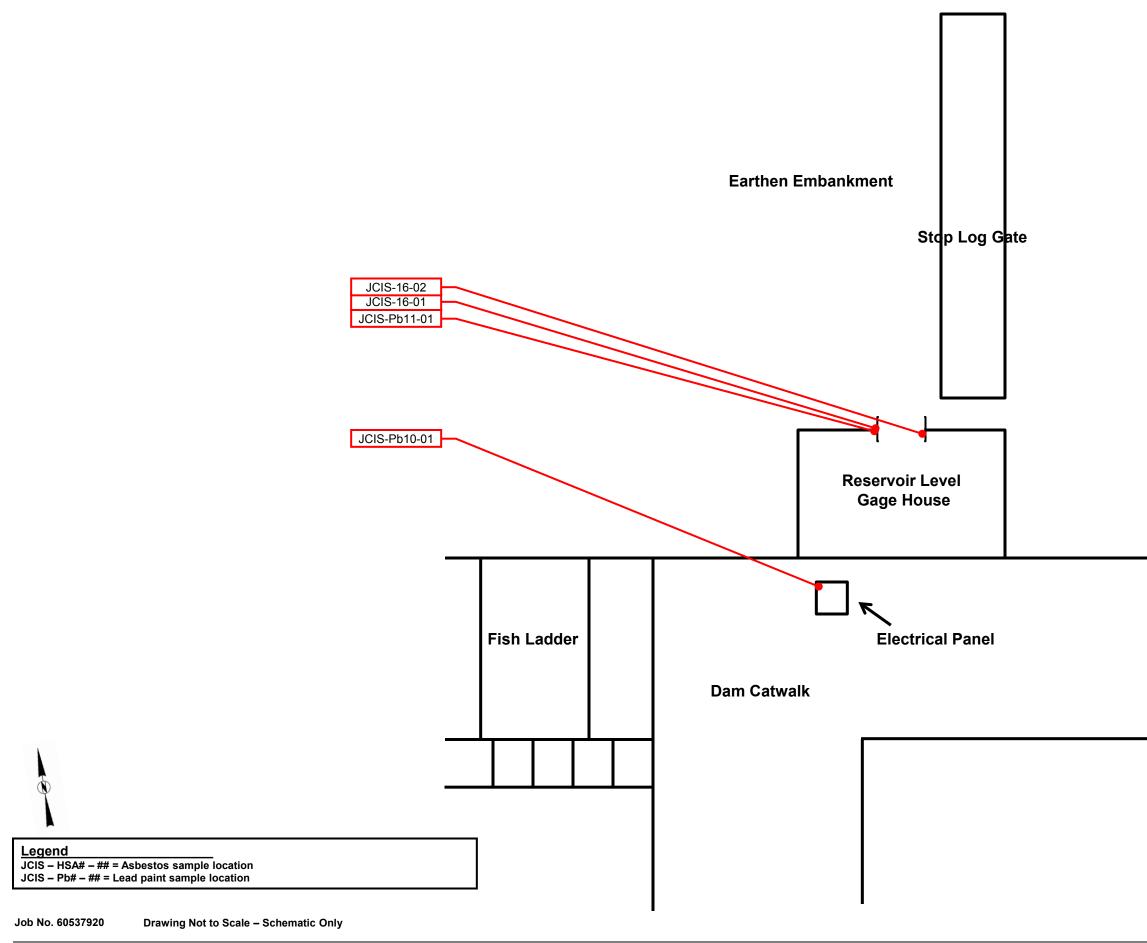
Asbestos and Lead Sample Locations Intake Structure/JC Boyle Dam – North Section
